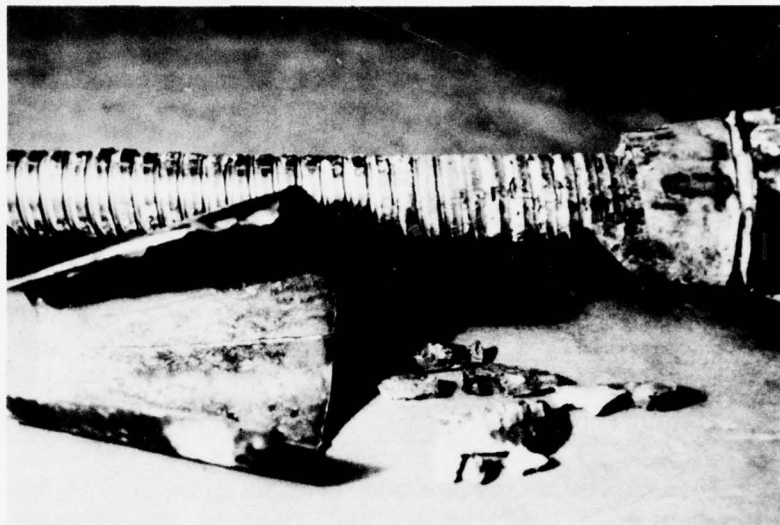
Rust on the bottoms of the funnel housing and conduit of beam 11 and pieces of grout that penetrated into the funnel housing
